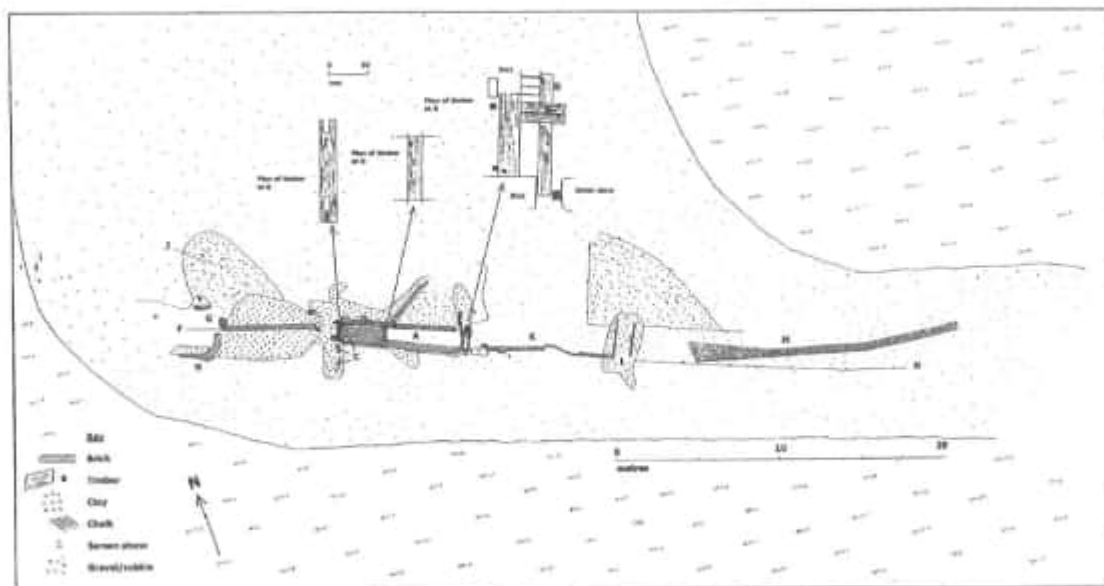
Area 1, plan of the brick channels in the south-west corner of the lake
